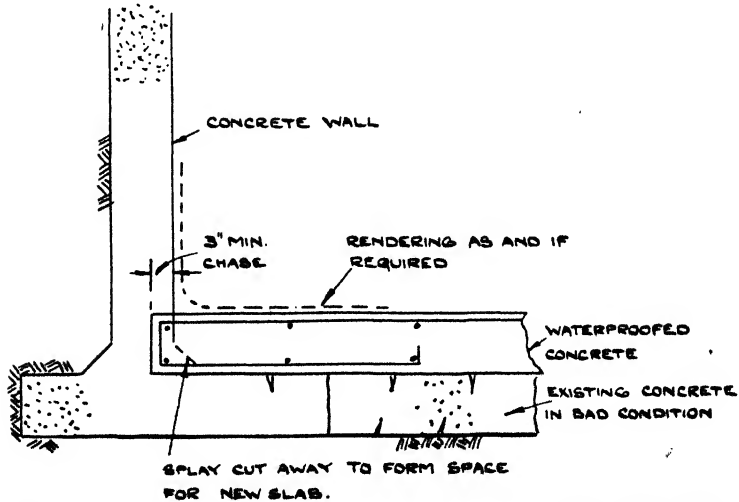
TYPICAL SUPERIMPOSED REINFORCED CONCRETE RAFT DESIGNED FOR WATER PRESSURE
